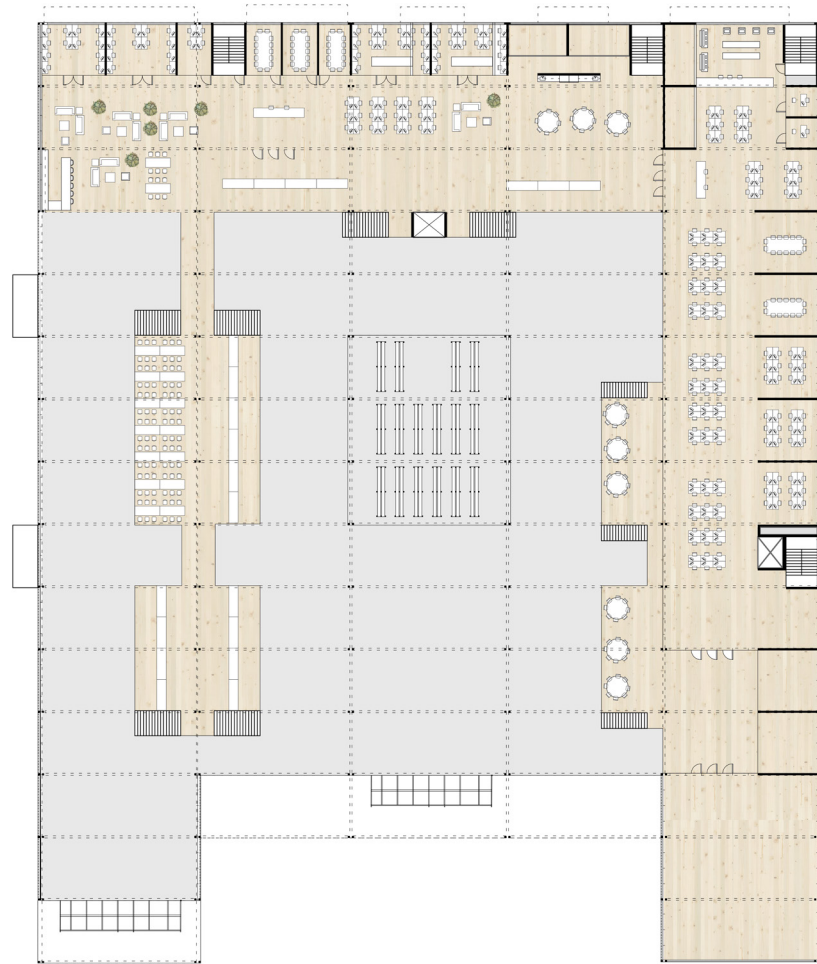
First Floor Plan. At 1.5x scale of ground floor plan.
